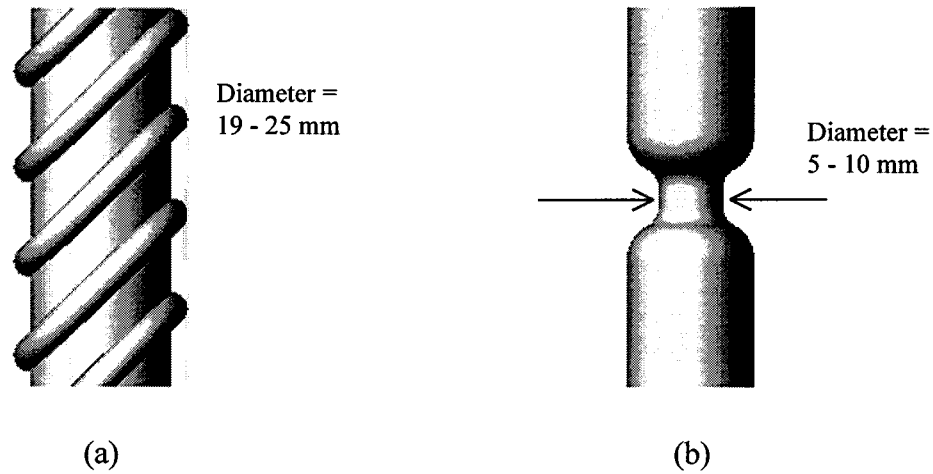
(a) Gage length of rebar specimen used in present testing (b) Typical fatigue test specimen used in conventional testing
